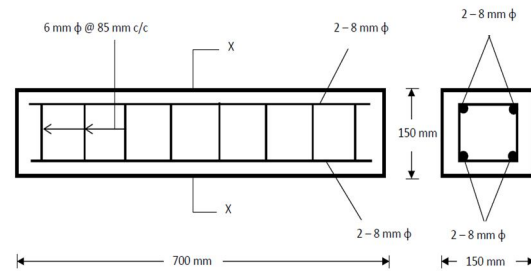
Details of reinforced concrete beam with shear reinforcement (Series B)
